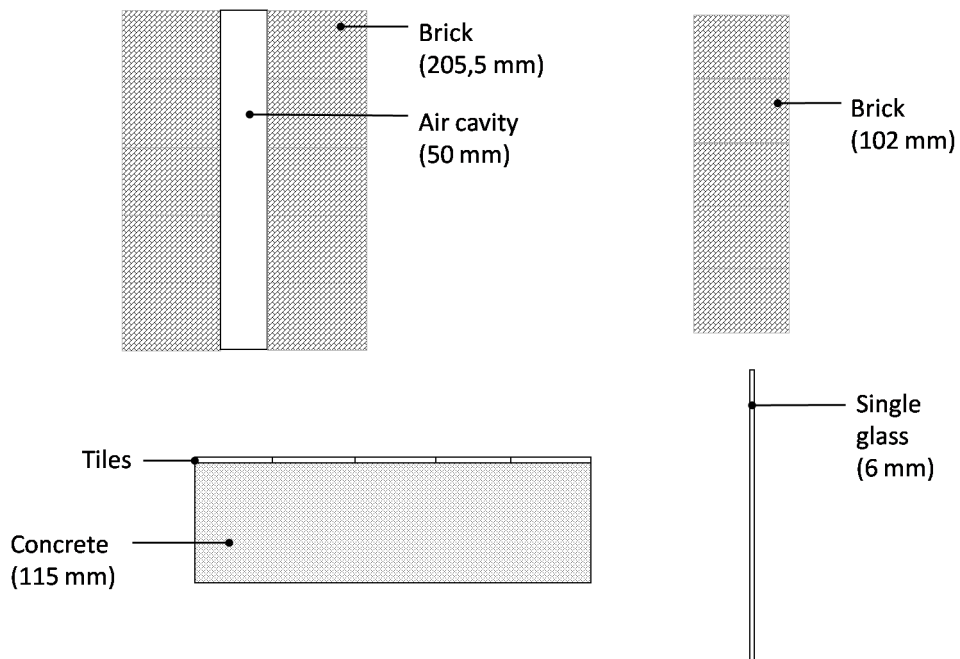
The room walls in Coventry university demo site. Top Left (a): façade, top right (b): interior wall, bottom left (c): floor and bottom right (d): Window.
